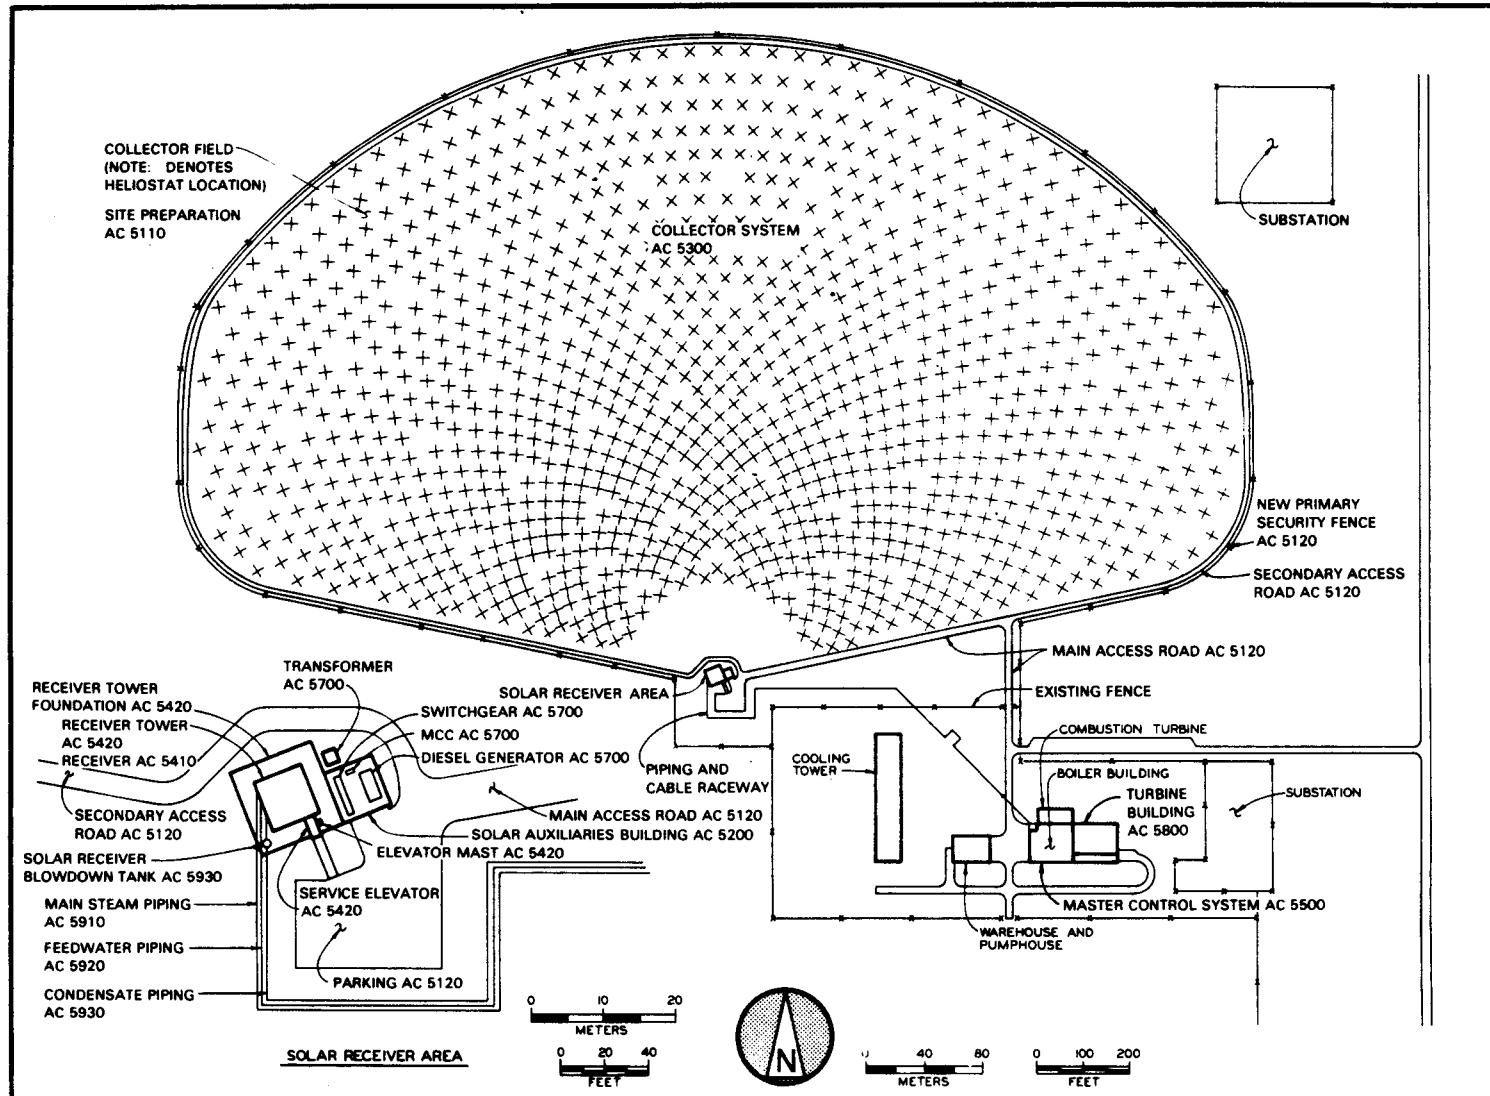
SOLAR COGENERATION FACILITY SITE ARRANGEMENT
